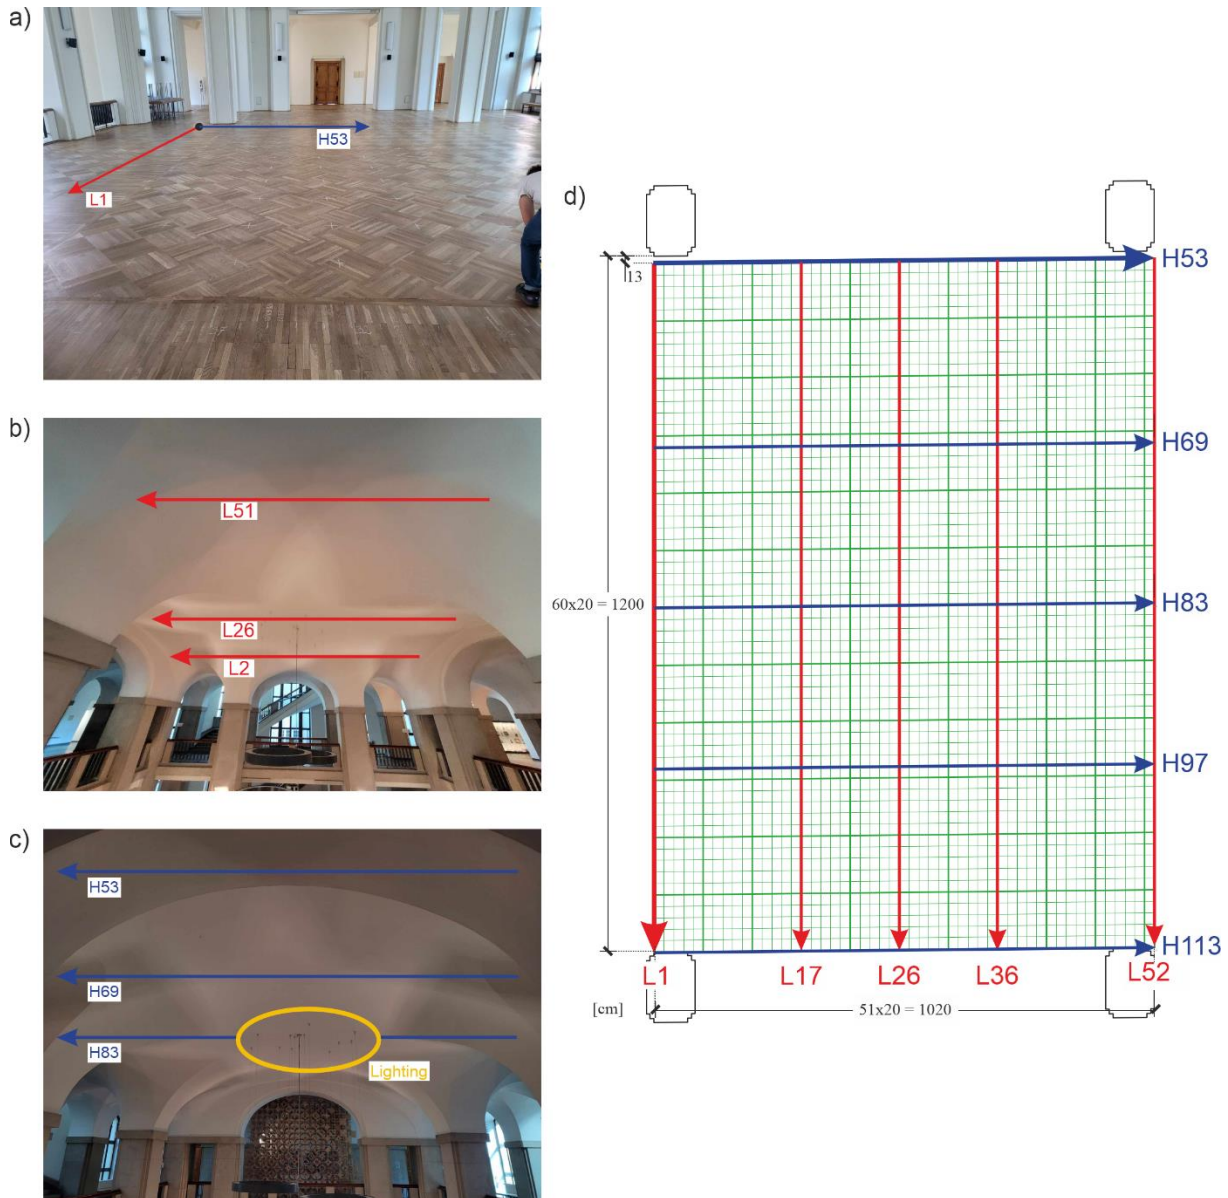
Measurement area #A: a) ceiling location, b) view of the ceiling from below – selected longitudinal profiles with a visible arched ceiling, c) view of the ceiling from below – selected transverse profiles with a visible arched ceiling and marking lighting, d) marking in the 3. floor plan.
